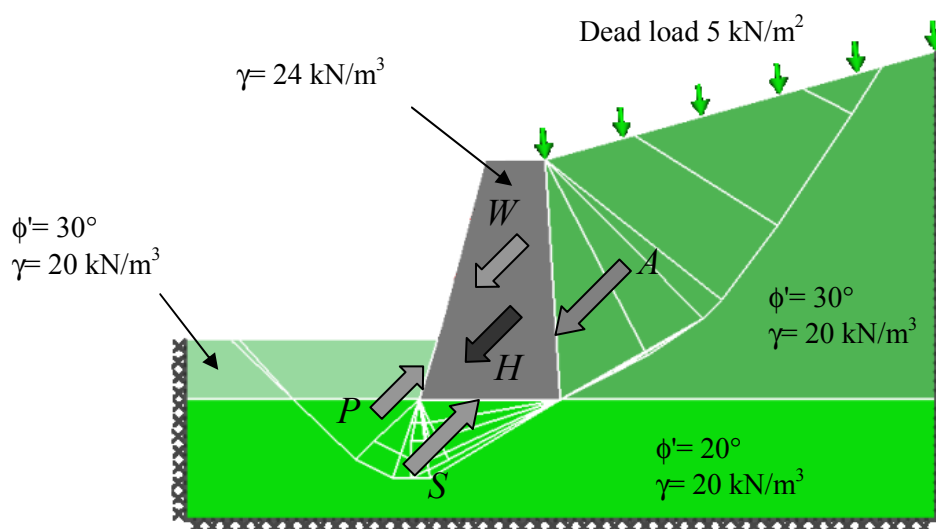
Design check against combined sliding and bearing capacity failure of a 4m high gravity retaining wall using LimitState:GEO (translational mode)
